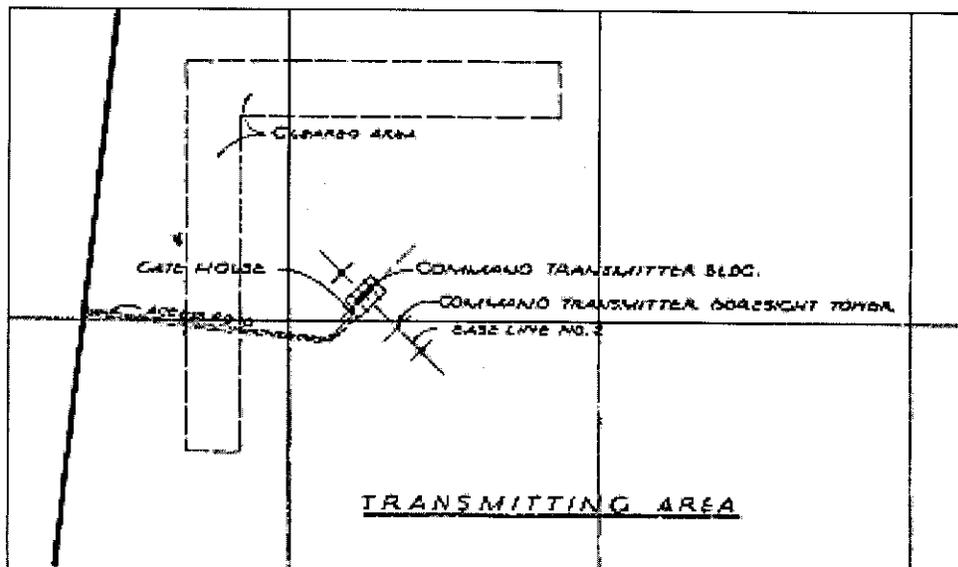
Detail, transmitting area, as-built drawing (survey marks removed). March 1961, AW-11-01-1000.
